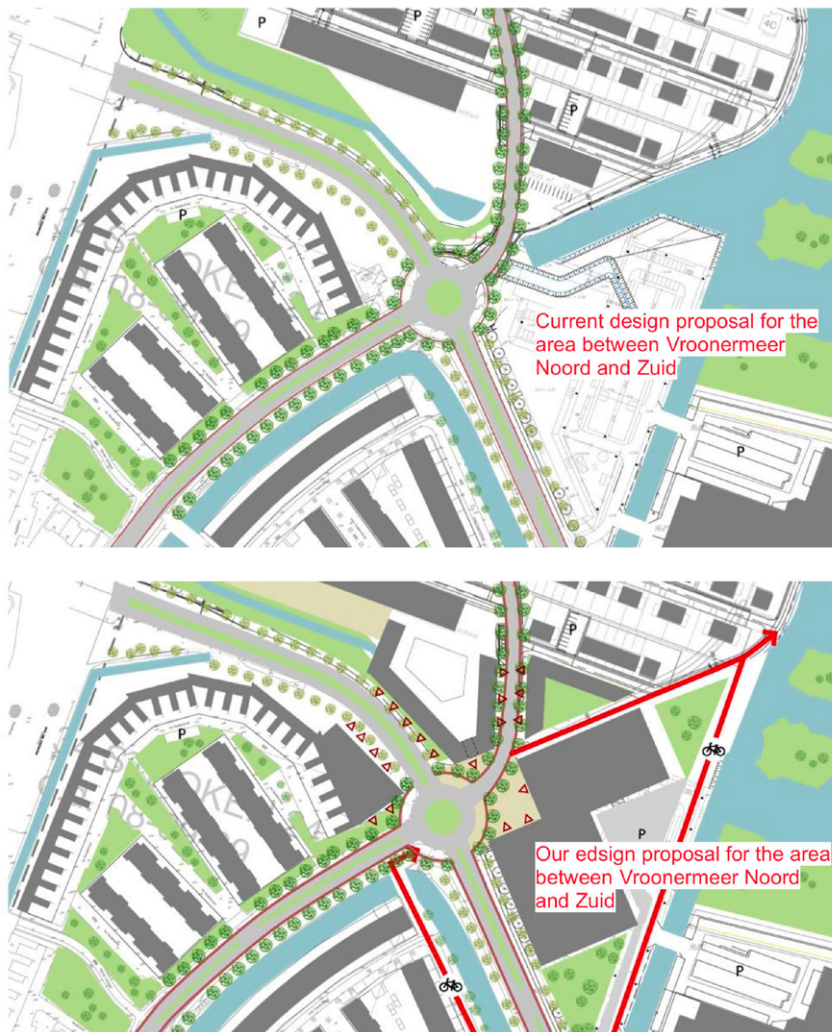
Plan for a new local centre between Vroonermeer-North and -South.
